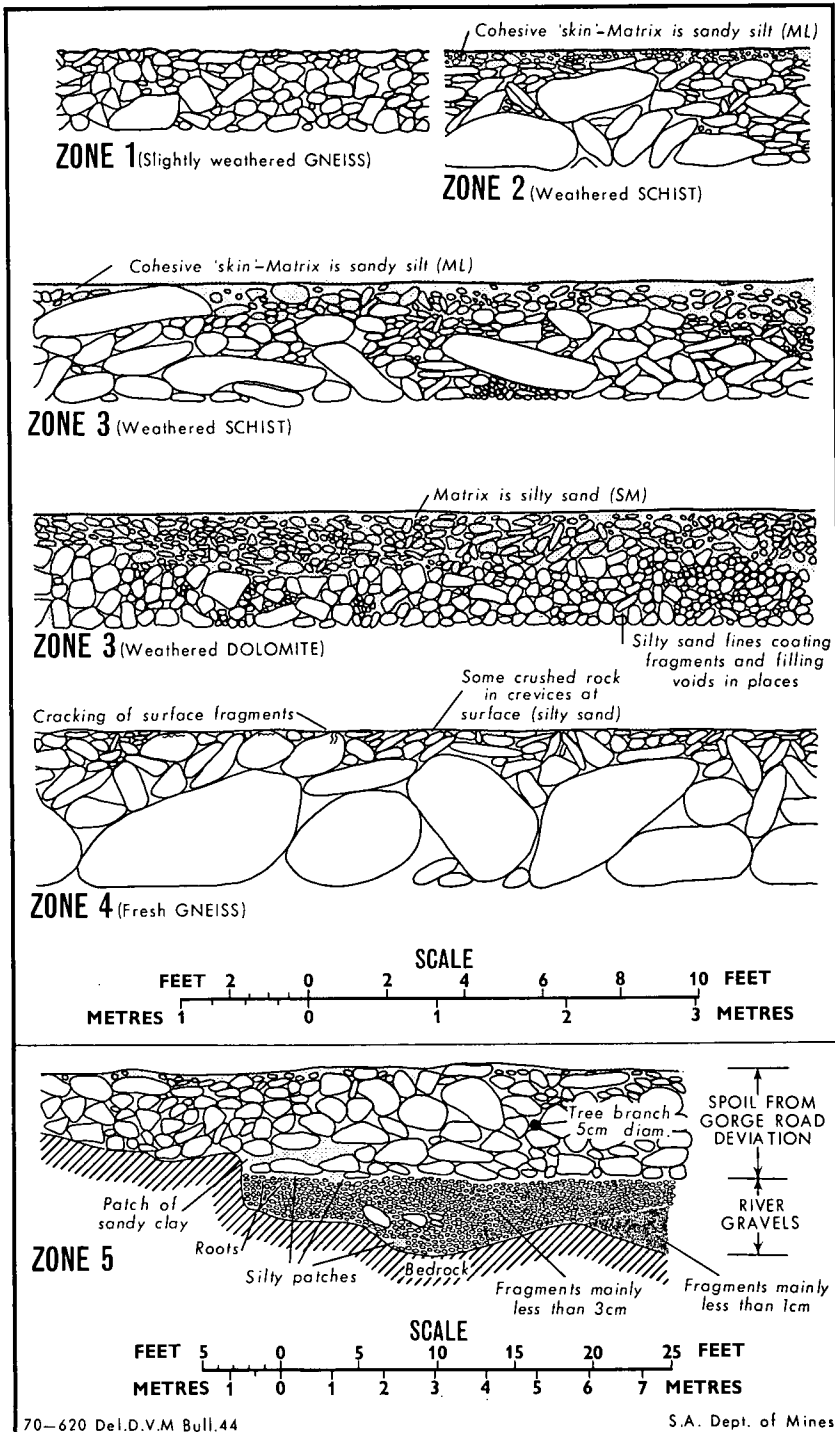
Embankment zones; diagrammatic sections through typical layers.
